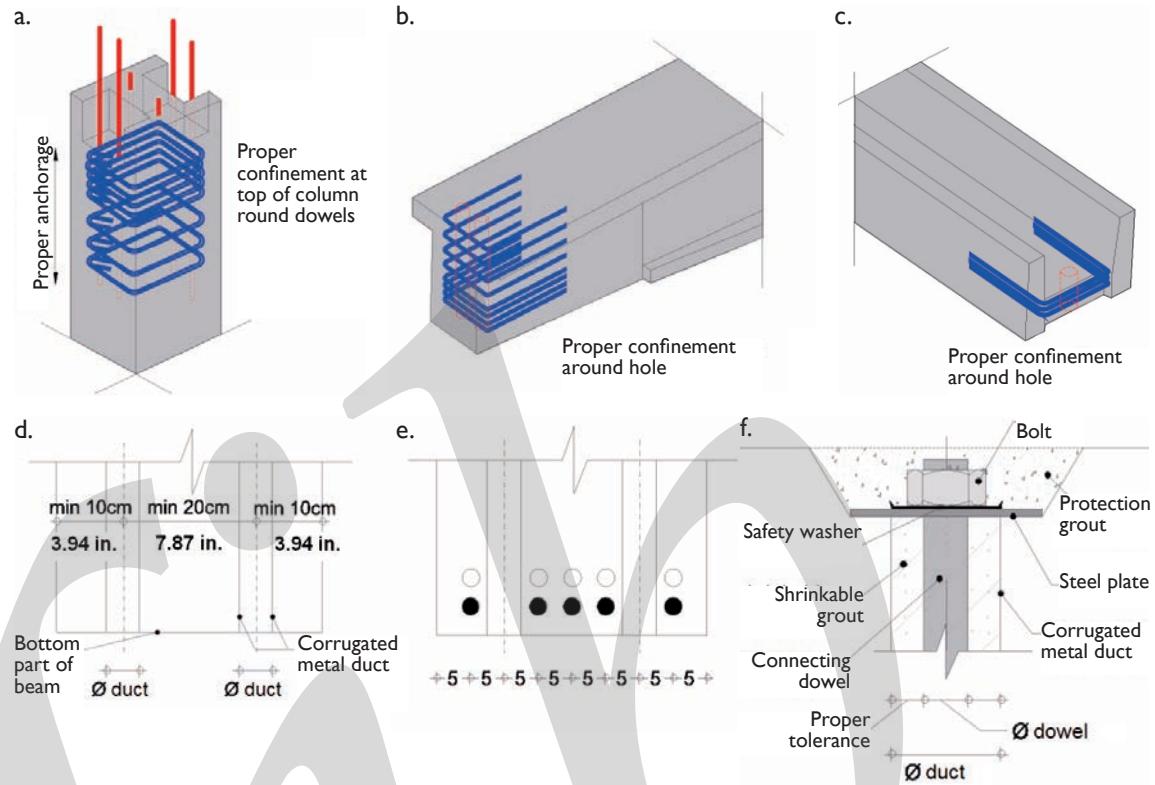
Details of Fig. 5-14. (Other reinforcements of precast members are not shown for clarity.)
